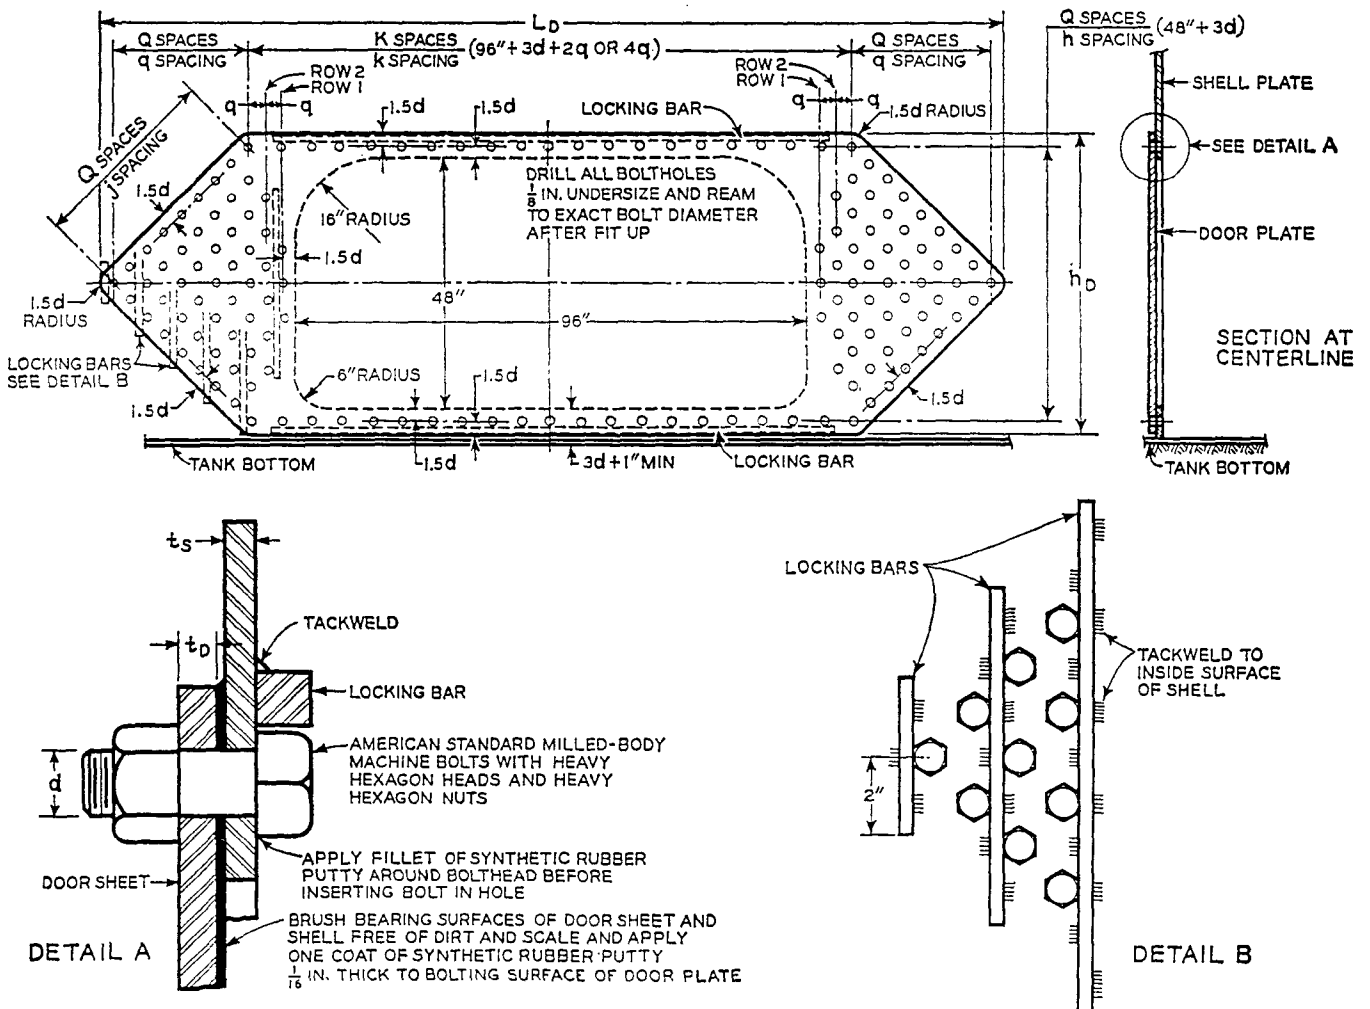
Raised-Type Bolted Door Sheet (See Tables 3-13 and D-6).
